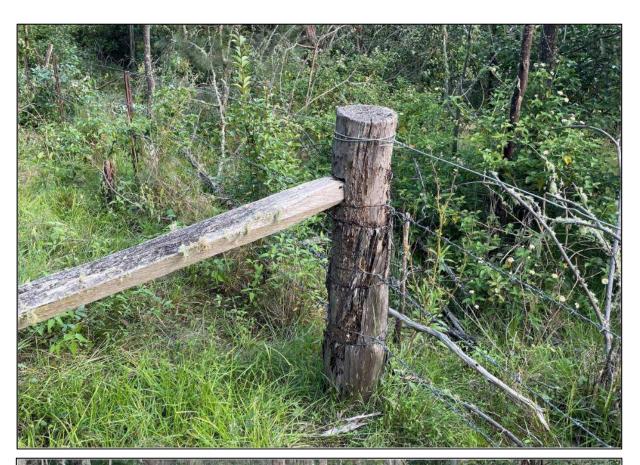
After photos – Perimeter fence with top strand of plain wire
